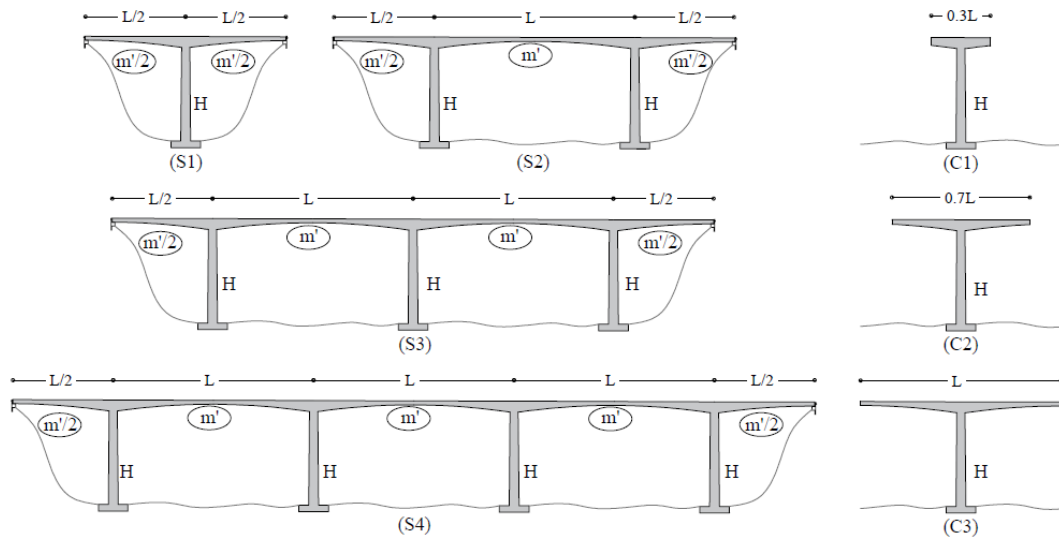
Structural configuration of studied bridges in service (S1, S2, S3, and S4) and during construction (C1, C2, and C3).
